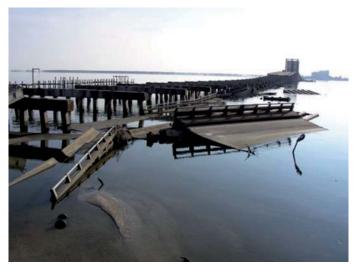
Deck damage on US90 bridge over Biloxi Bay.
